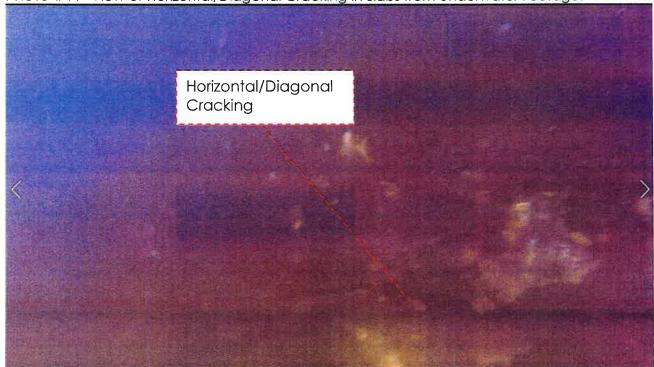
View of Horizontal/Diagonal Cracking in Slabs from Underwater Footage.
